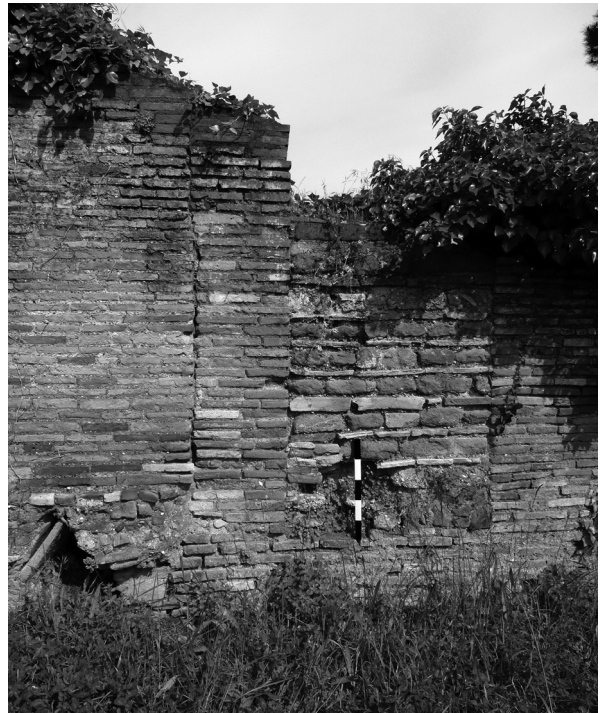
105 – Door opening between room 01 of Building IV ii 12 and the passage west of the building was walled up during a late period of use
